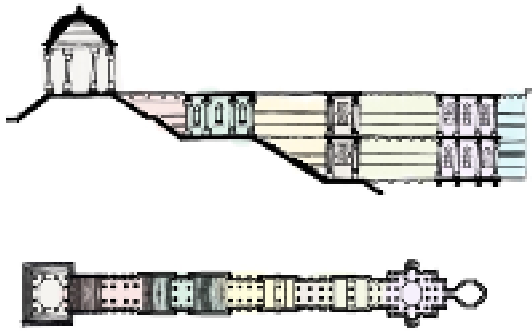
Plan and Section of Dada Harir Stepwell, Gujarat
